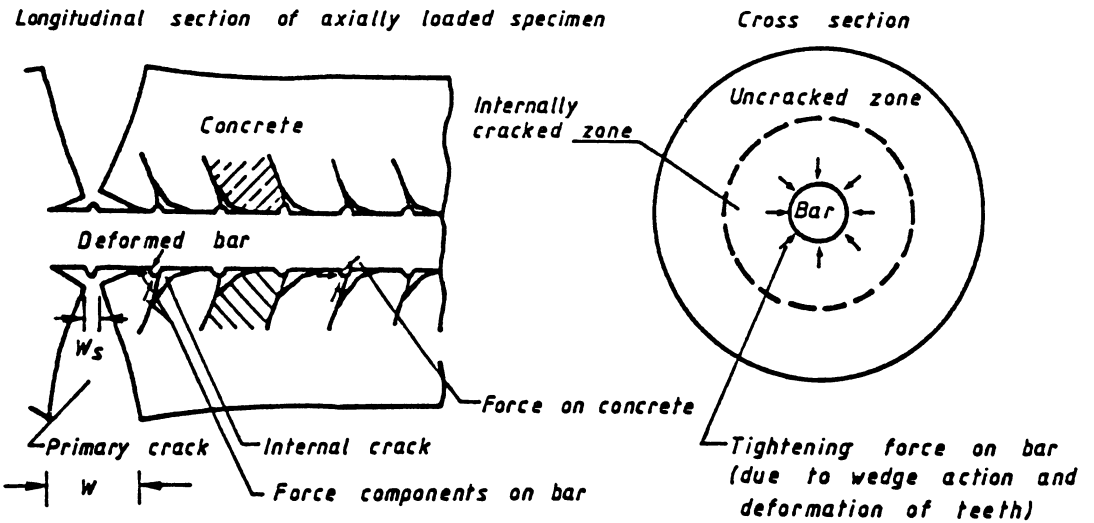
Detail of crack near a reinforcing bar and local slip.
